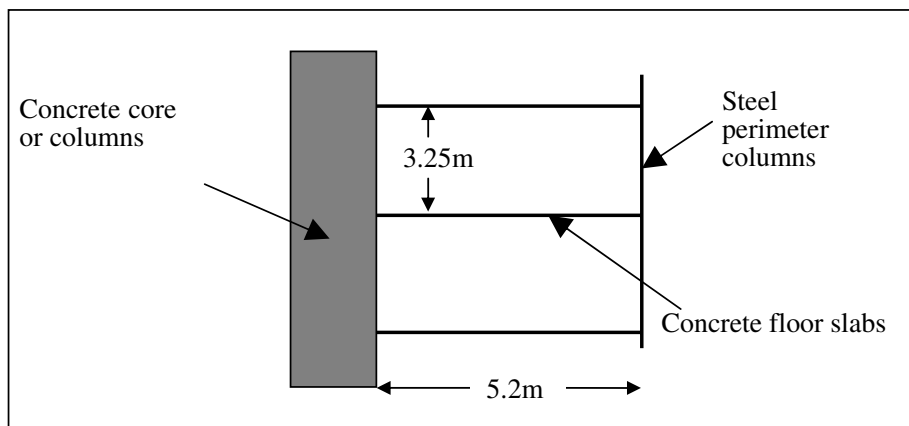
Cross-section of floor slabs, concrete core and steel perimeter columns
